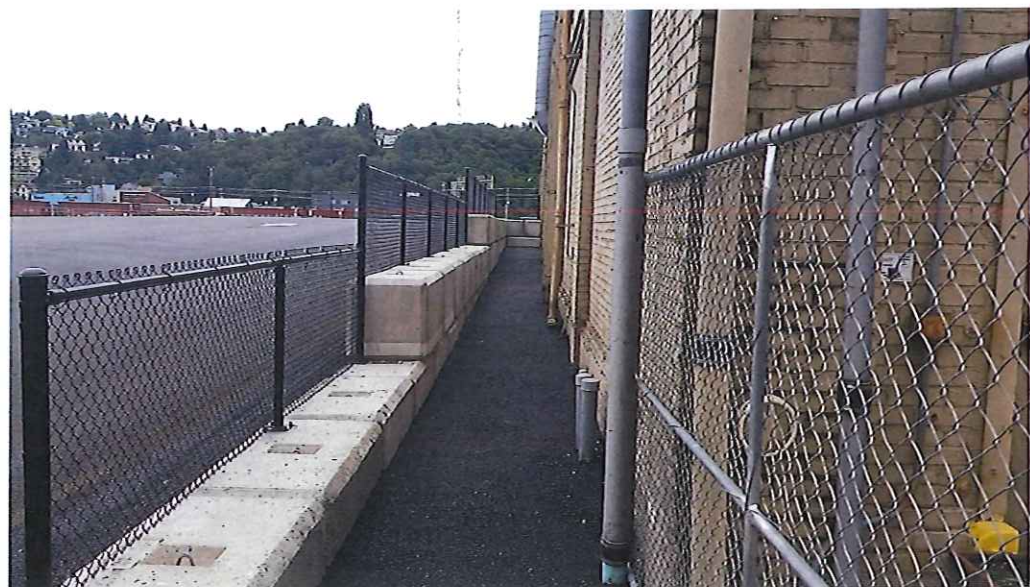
LOOKING EAST ALONG NORTH SIDE OF M-28 AT BLOCK RETAINING WALL
